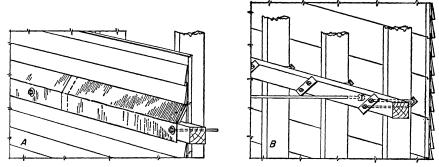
Methods of reinforcing wall for greater depths of grain than shown in table 3: *A*, Exterior stay timber with flashing; *B*, inside stay timber secured to studs with U-bolts, the tie rods extending through the timber.
